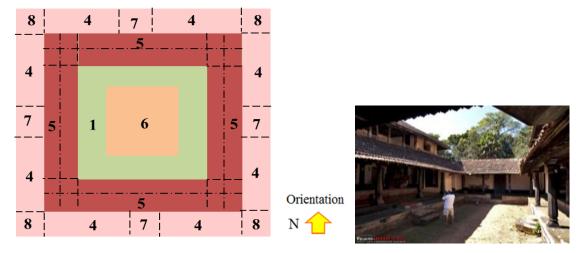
Sarvatobhadra (1 – Veranda, 2 - Portico, 3 – Pillared court, 4 – Gallery, 5 – Main Building, 6 –Open court, 7 – Foreparts , 8 –Outward corner rooms) (Source: www.team-bhp.com)
